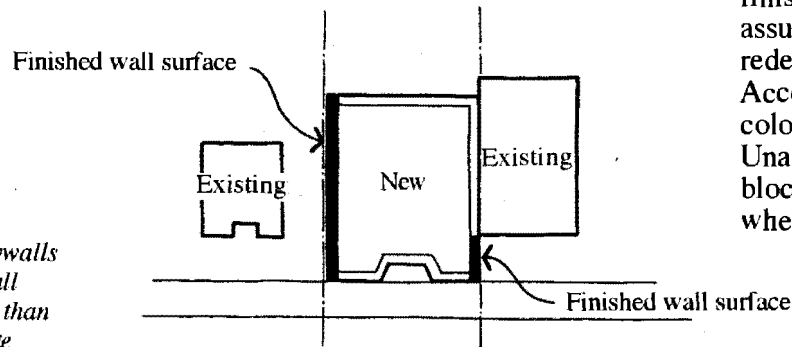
Partywalls must have a wall treatment other than standard concrete block.
